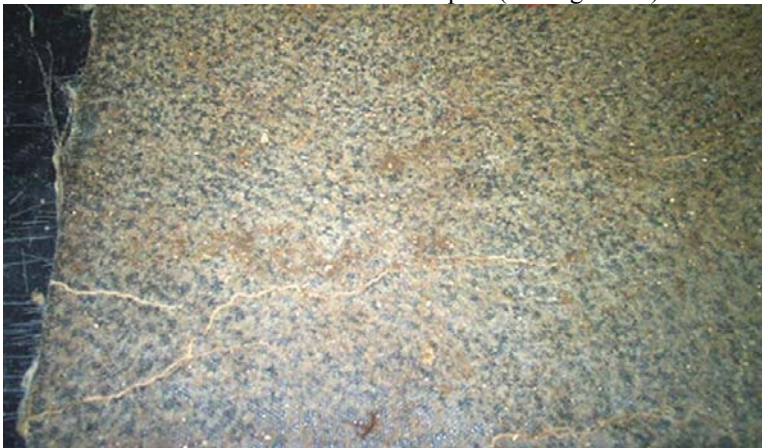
A-3 GCL sample specimen at manufacturer's laboratory exhibiting roots (from Mackey & Olsta 2003)
